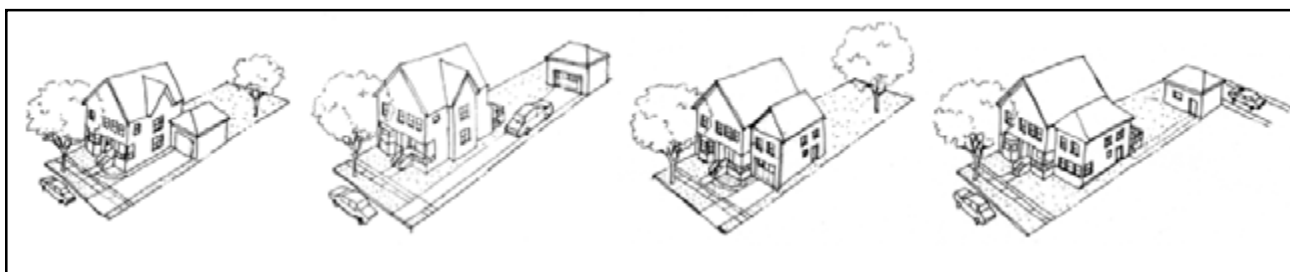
City of Vaughan. Where the house proportion is well balanced with the garage, opportunities to plant street trees and landscape the front yard are increased.
